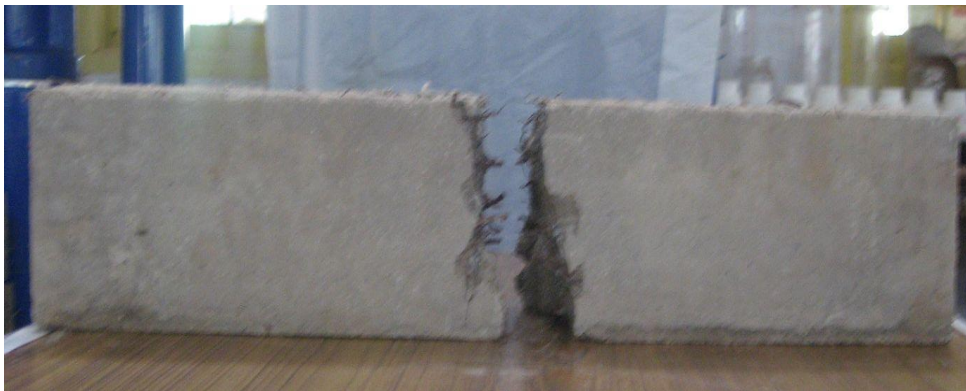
Fractured surface of Steel Fiber Reinforced Fly ash concrete beam
